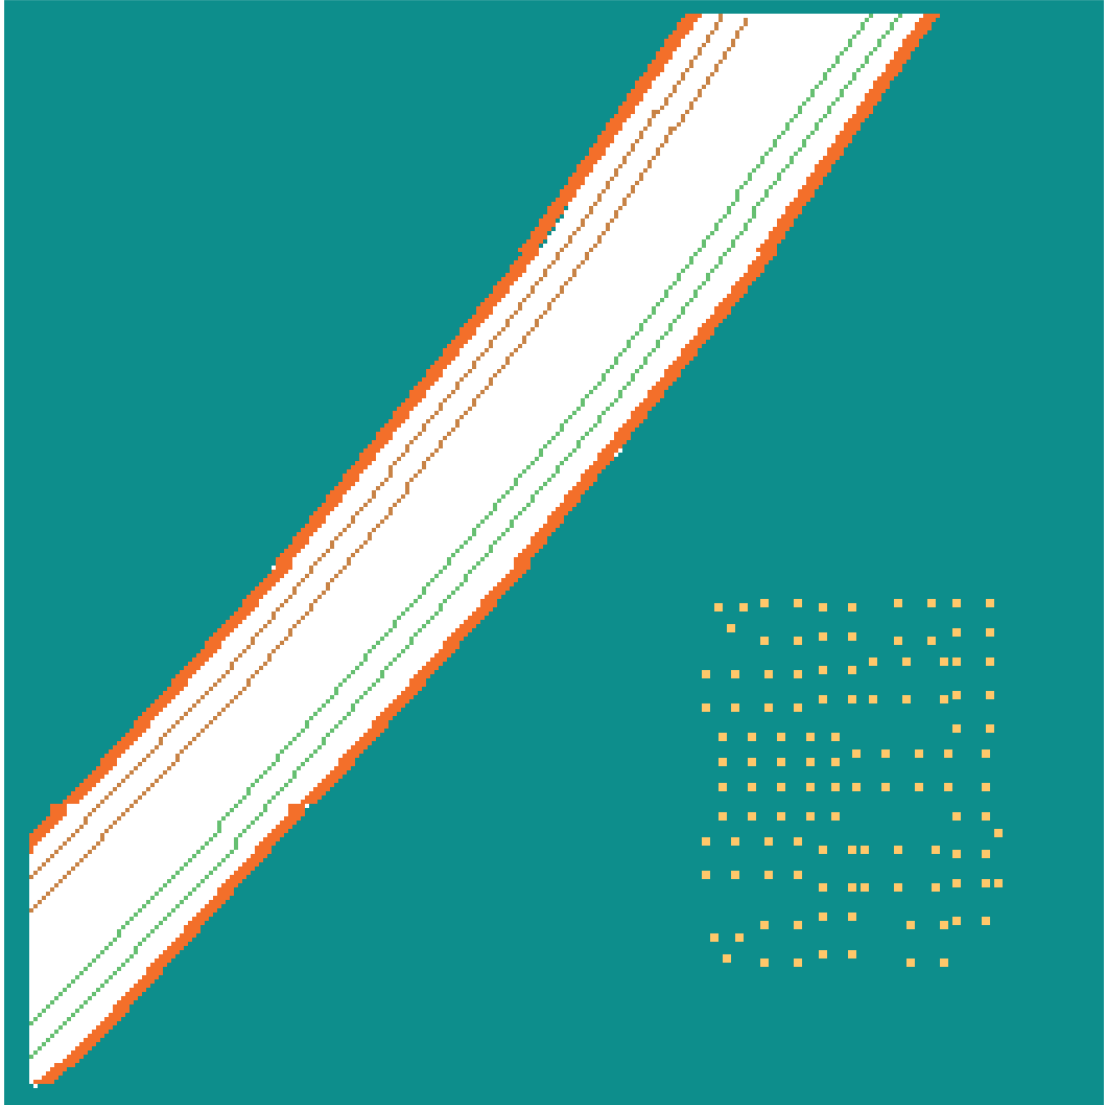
Horizontal section through the model of the East Block of Building W1 at track level, showing tunnel, track, soil and horizontal section through piled foundations
